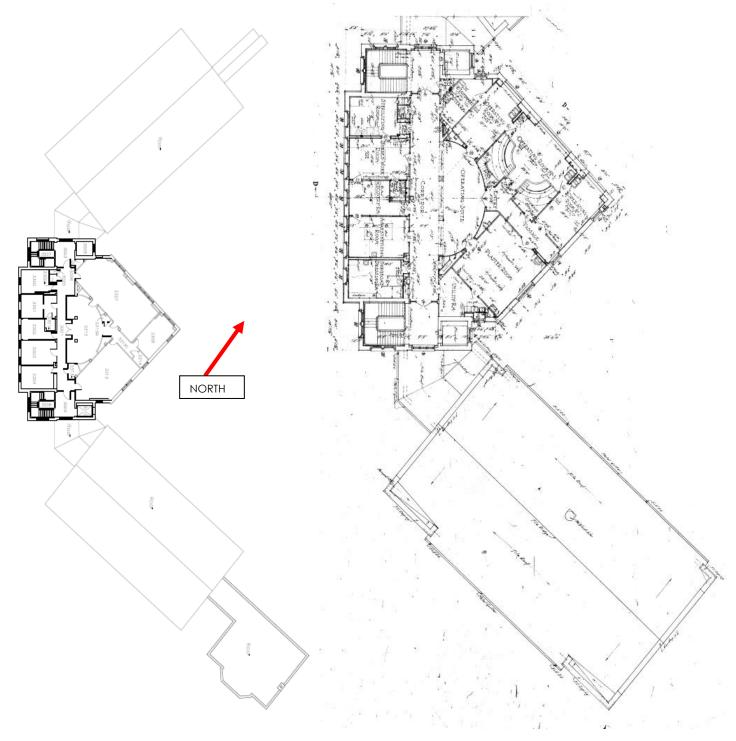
2nd Floor Plan of original building (Parts 1-3). The top plan shows the original second floor as designed in 1922; no as-built drawings were located so any deviations from the plan could be historic. Source: William B. Ittner "New Hospital Building," 1922 and revised 1927. The plan below shows the existing conditions today. Source: The Lawrence Group. Existing Conditions, 2014. Changes include office expansions, & framing in the hall at the reception. The 1928 classroom addition roof (Part 4) is at far right.
